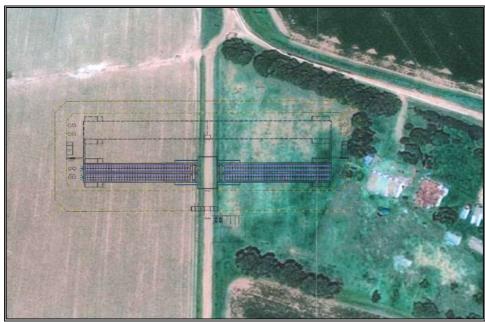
Layout 1 (designed by Dalein Plaasbou, 2017)
